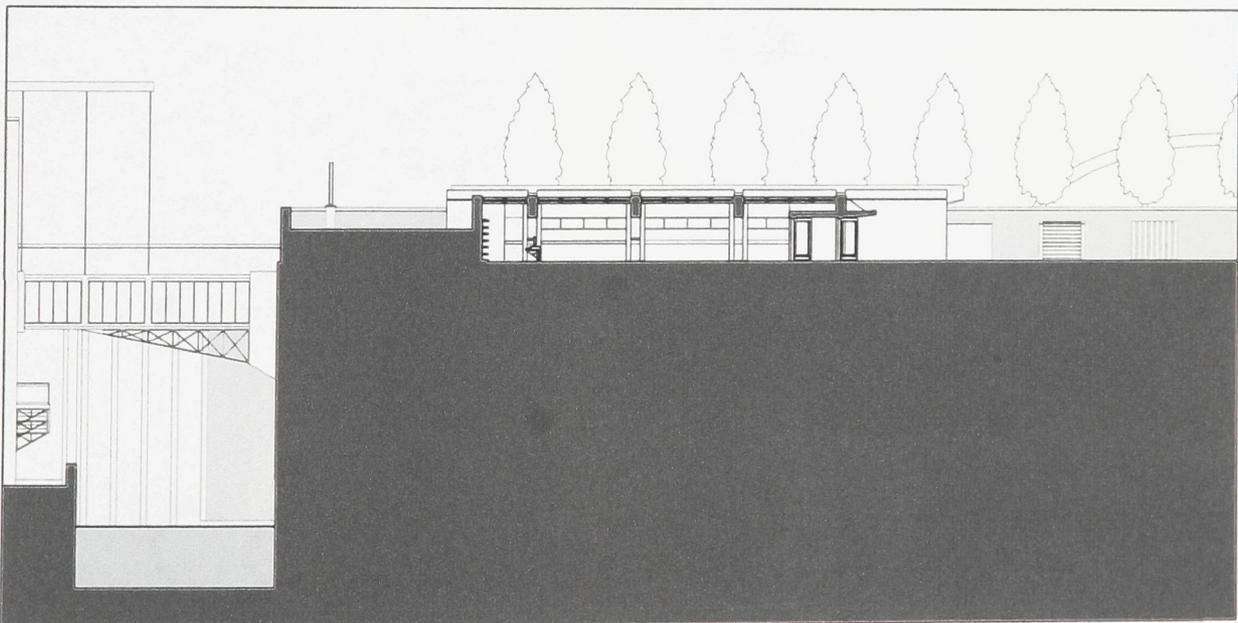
Hydroelectric Facility: Longitudinal Section*, AutoCad drawing @1:400, 2005. Created by author.
